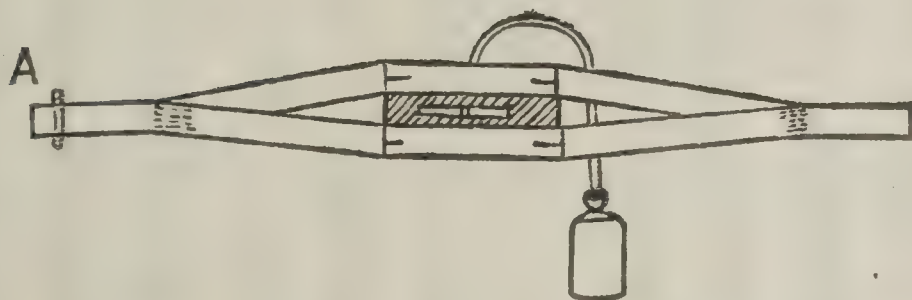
METHOD OF ARRANGING STRAPPING ON STIRRUP OR "SPREADER"
